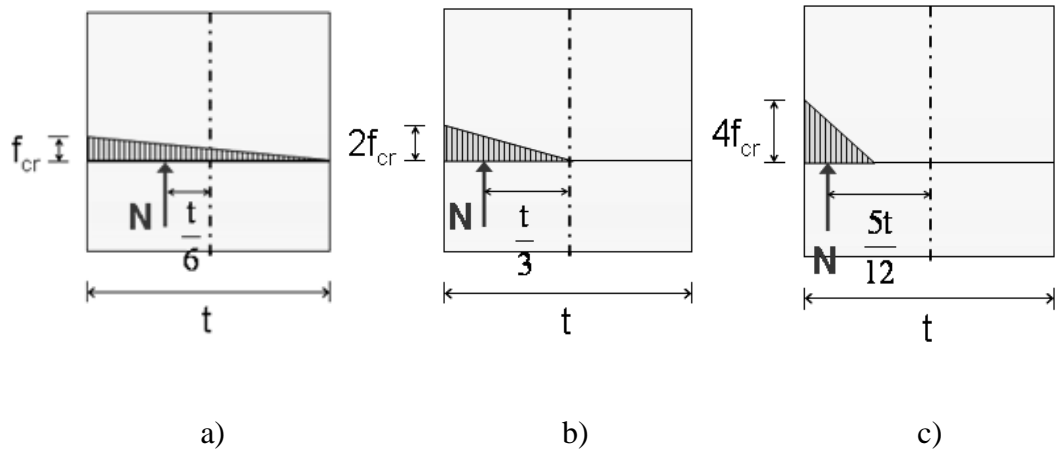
7. Stress distributions in the center of the masonry wall at different stages of out-of-plane action: a) onset of cracking, b) half-cracked, c) 3/4 cracked
